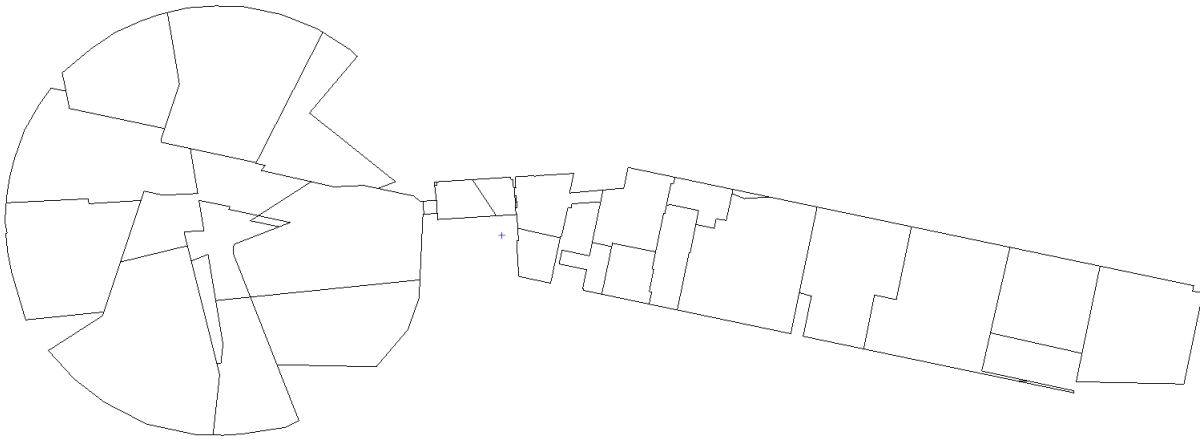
Plan view of F2050 reconstruction using 26 ground floor scans w/ blinds down
